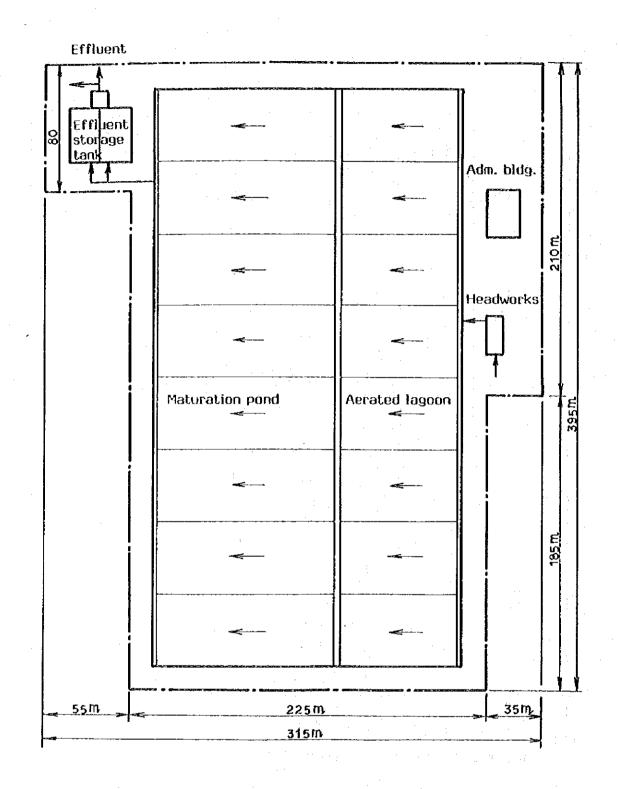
Layout Plan of Aerated Lagoon Plant
